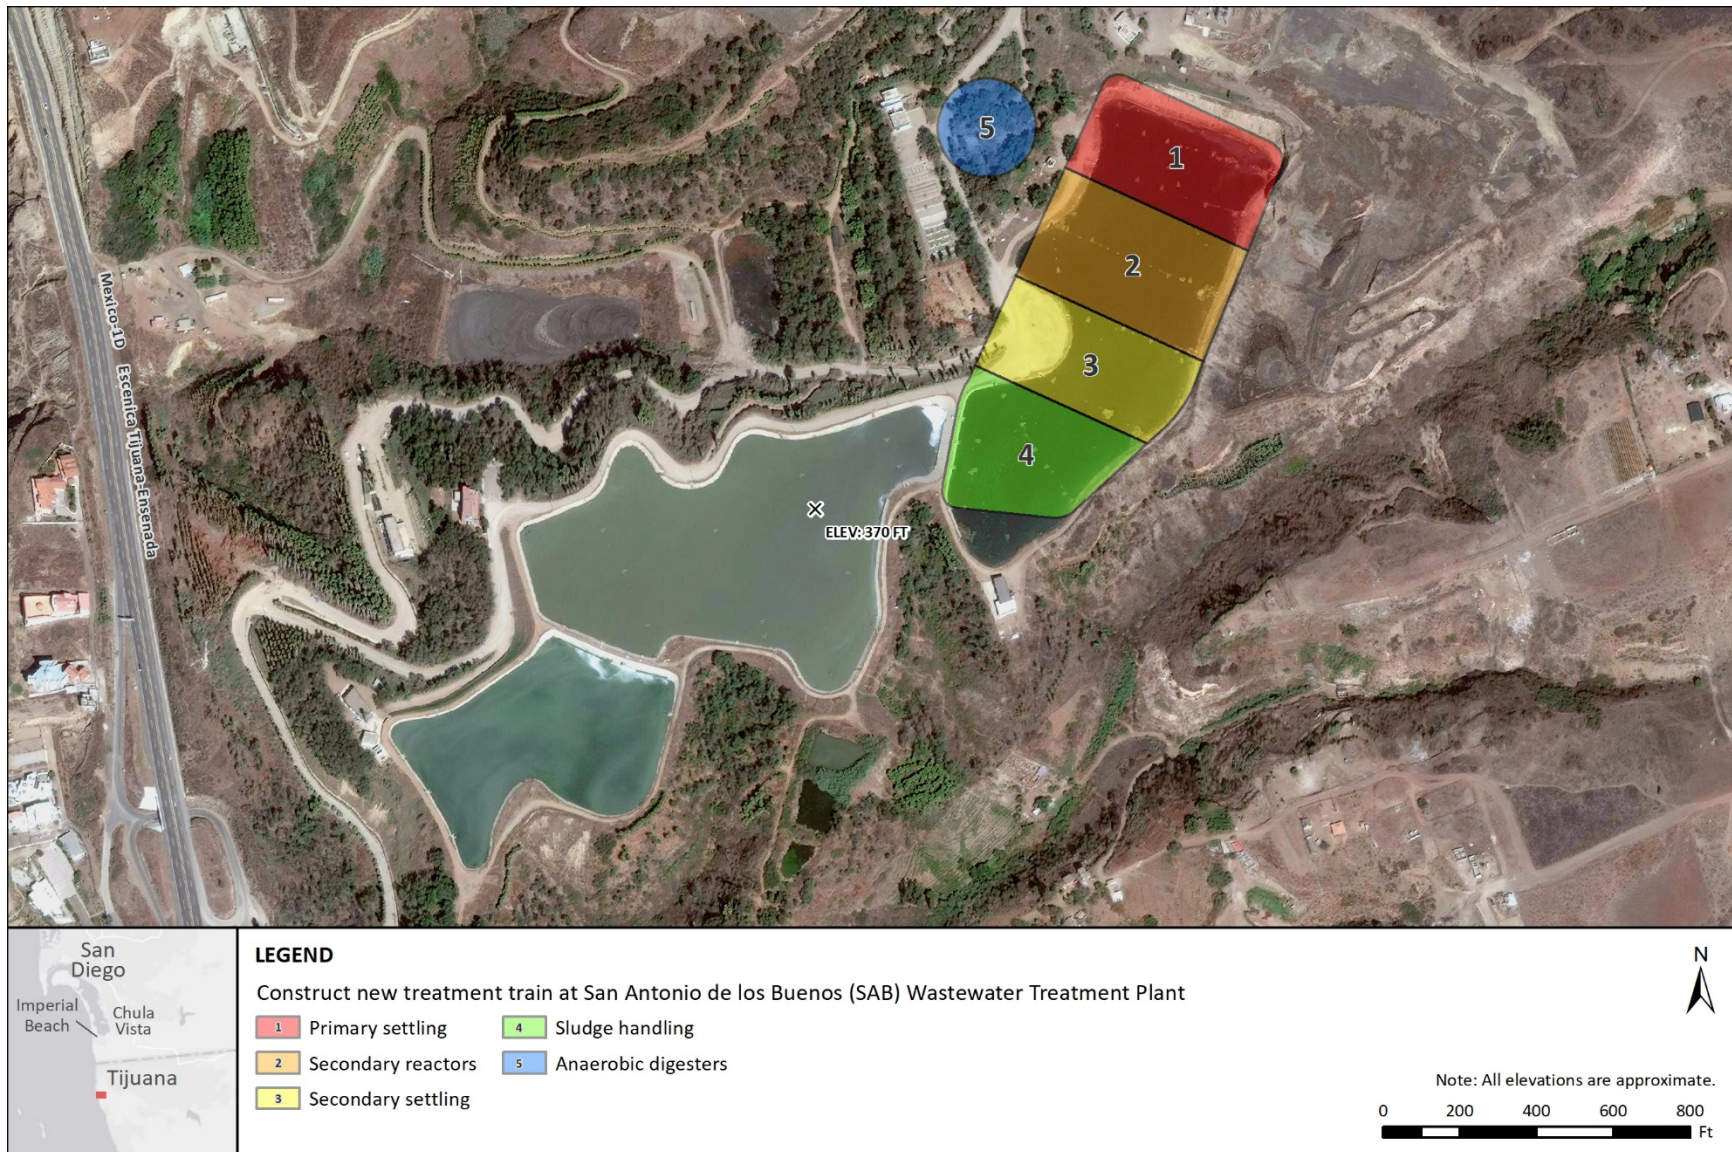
Proposed Layout of the Step-Feed Activation Sludge Facility Within the SABTP Footprint
